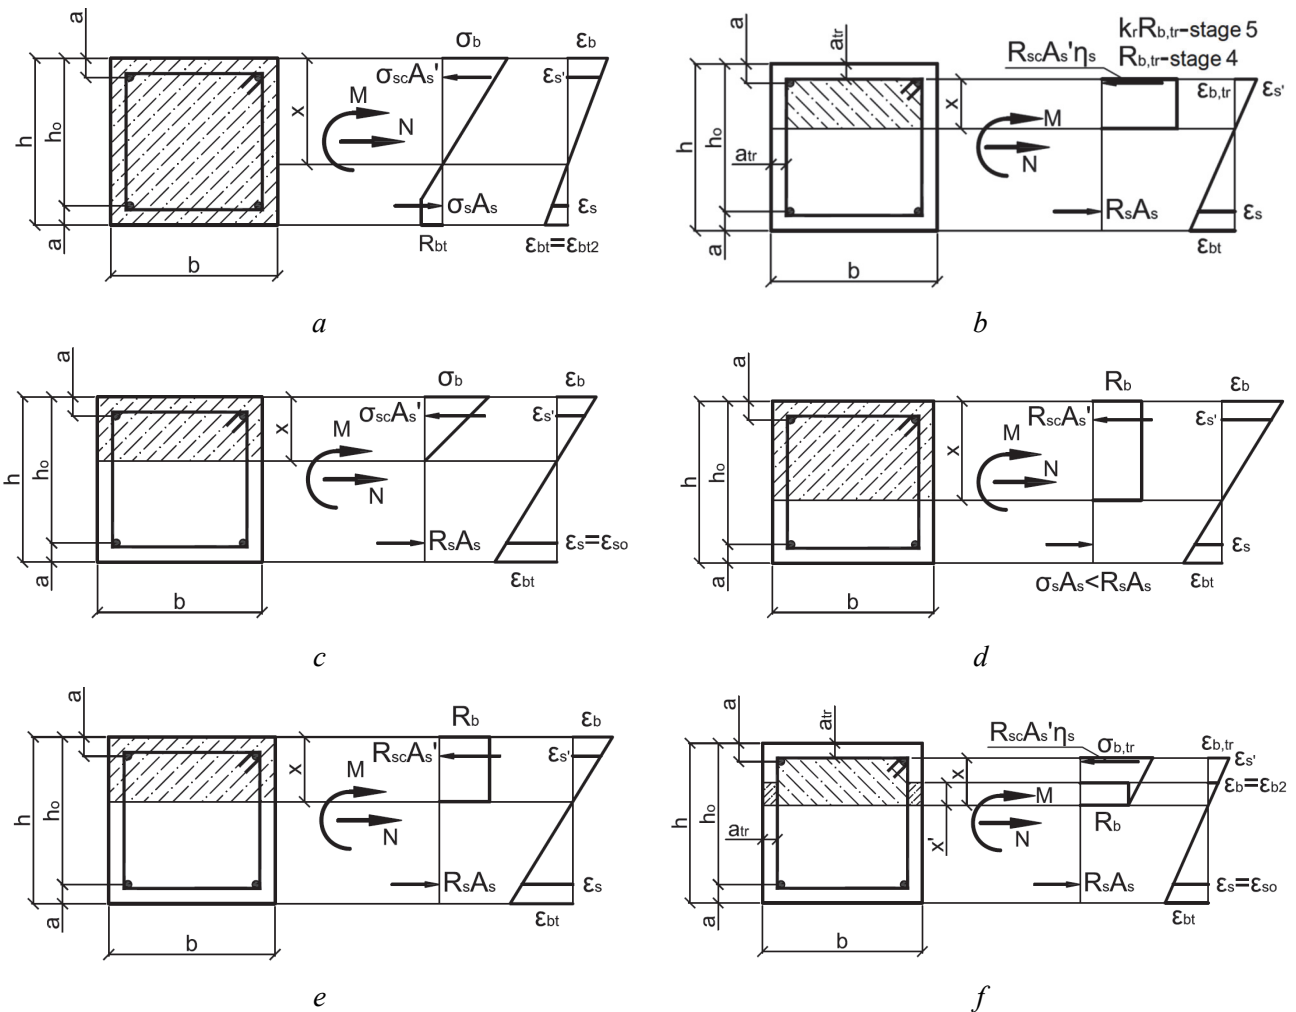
Stages of the stress-strain state of a reinforced concrete column: a – stage 1; b – stages 4 and 5; c – stage 2.1; d – stage 2.2; e – stage 3.1; f – stage 3.2
